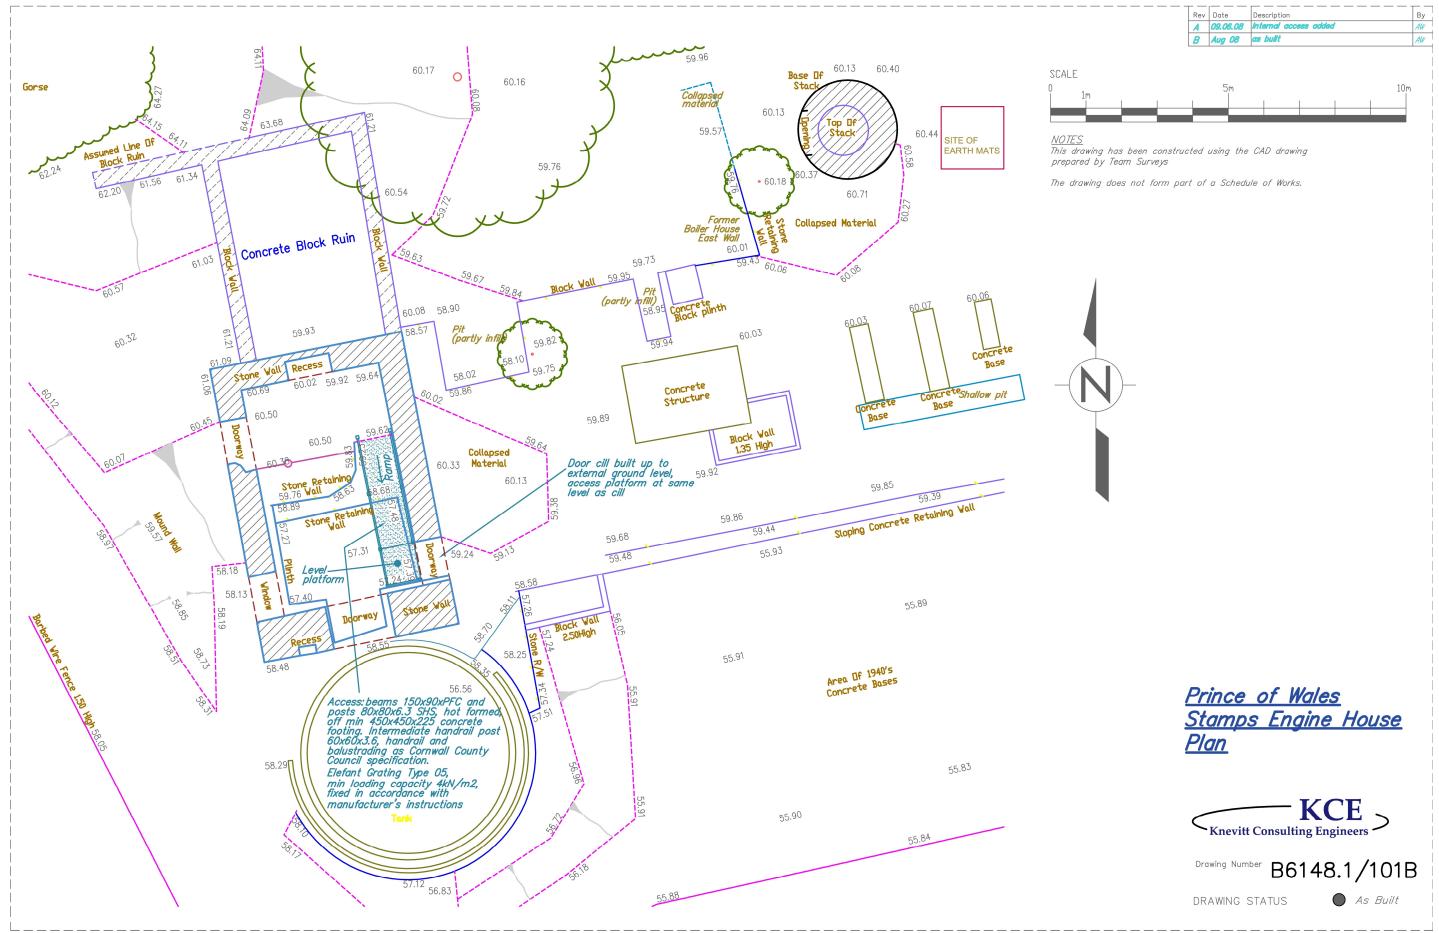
'As built' survey plan of the stamps engine house, boiler house chimney and 1940s dressing floor after works (Knevitt Cons. Engs. 2008)
